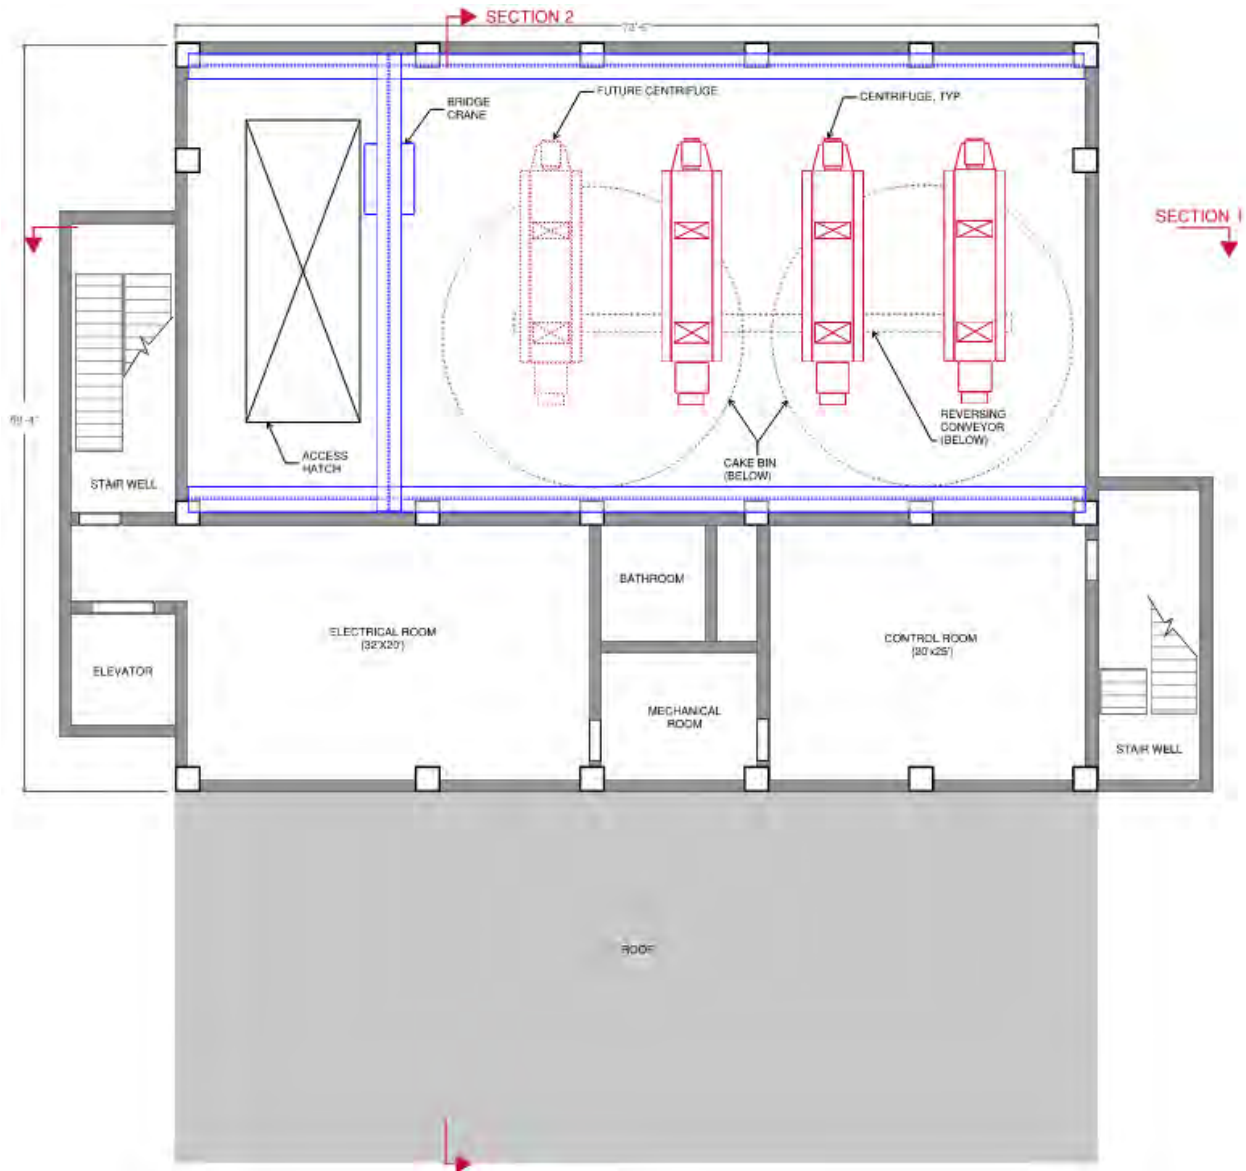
New Thickening/Screening/Dewatering Facility Upper Floor Plan
